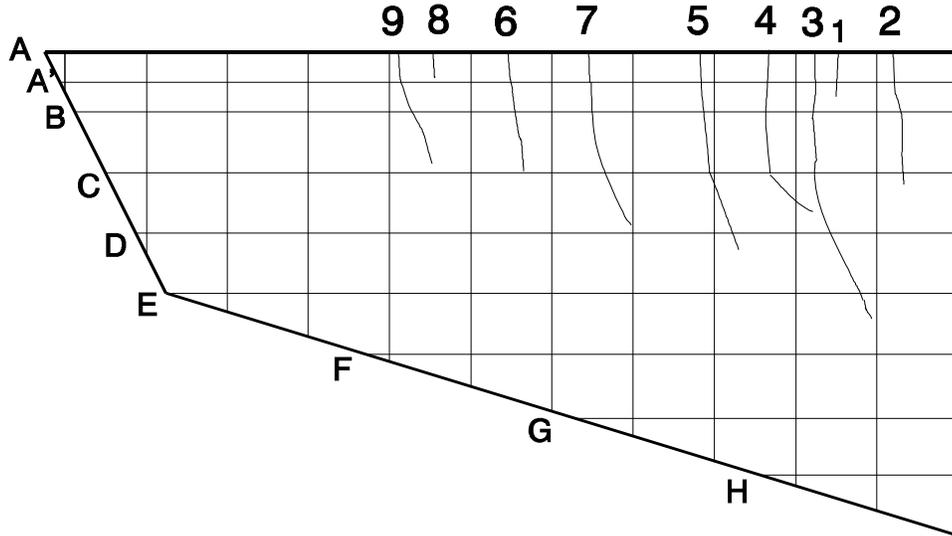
POJ-RC-100-TH cracking pattern on south face of overhang at service load
